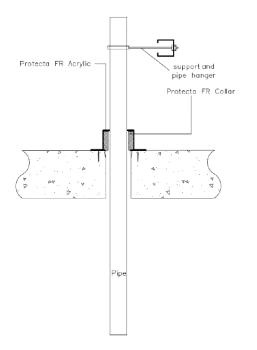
General arrangement of various plastic pipes penetrating a 150mm thick concrete slab protected with Protecta FR Collar installed on the unexposed side
